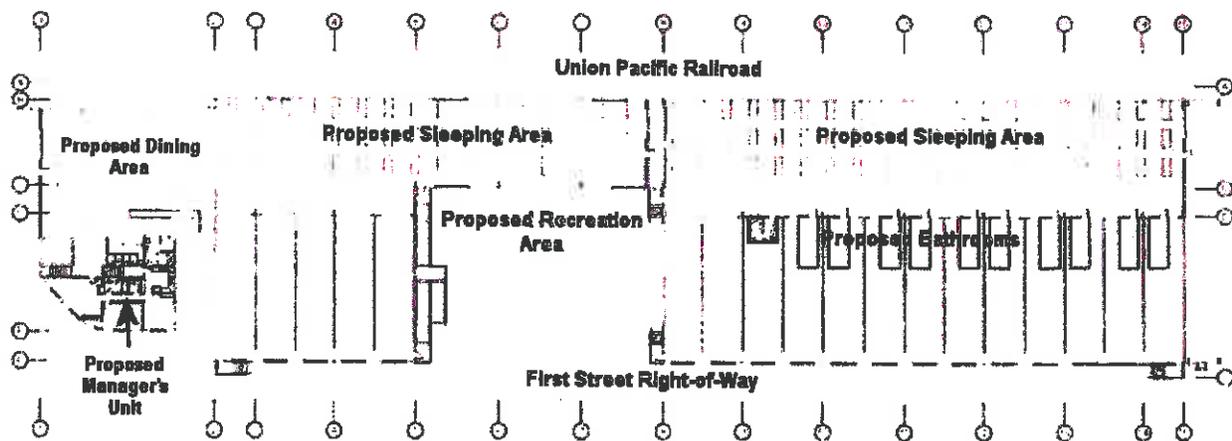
Revised Floor Plan Farmworker Housing 218 N. First Street
